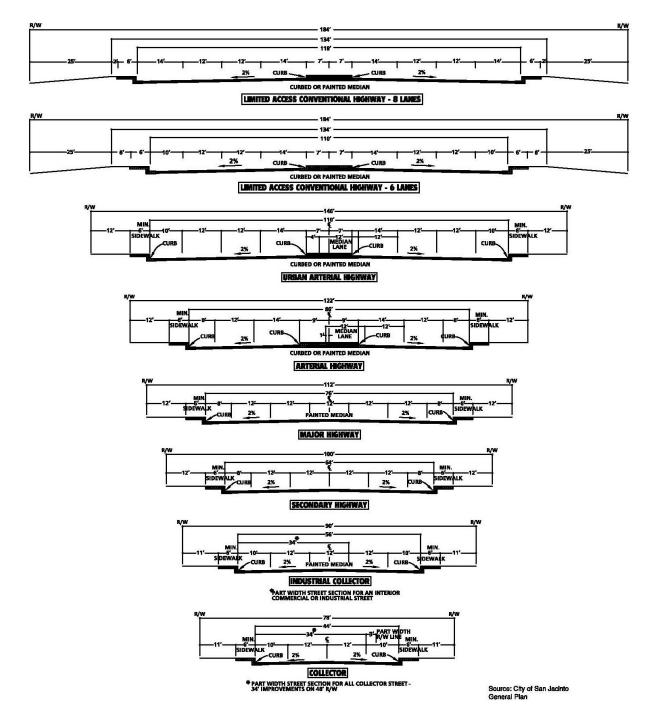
CITY OF SAN JACINTO GENERAL PLAN ROADWAY CROSS-SECTIONS
